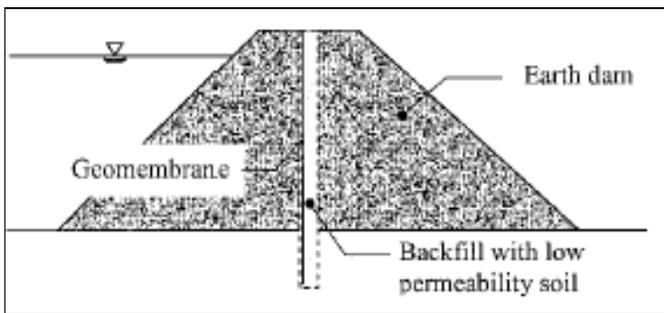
(C): Geomembrane Waterproofing Of Existing Dam
